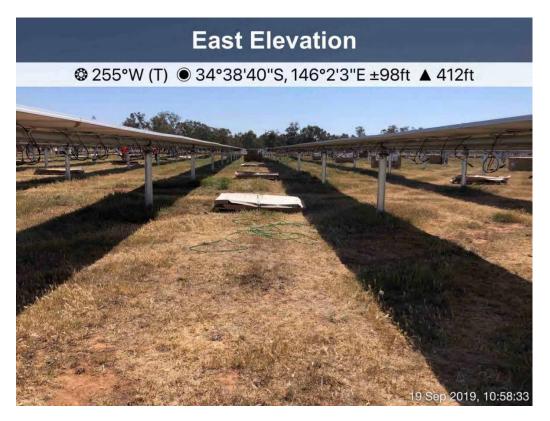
Existing drainage channel has been maintained (not altered) to traverse under installed panels near to front of site, allows for natural drainage movements to prevail
